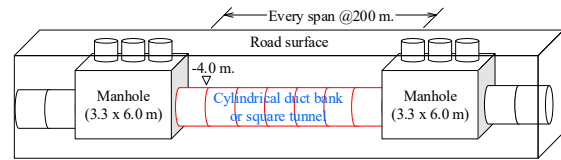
Construction of the underground power cables in Thailand by using the pipe jacking method
